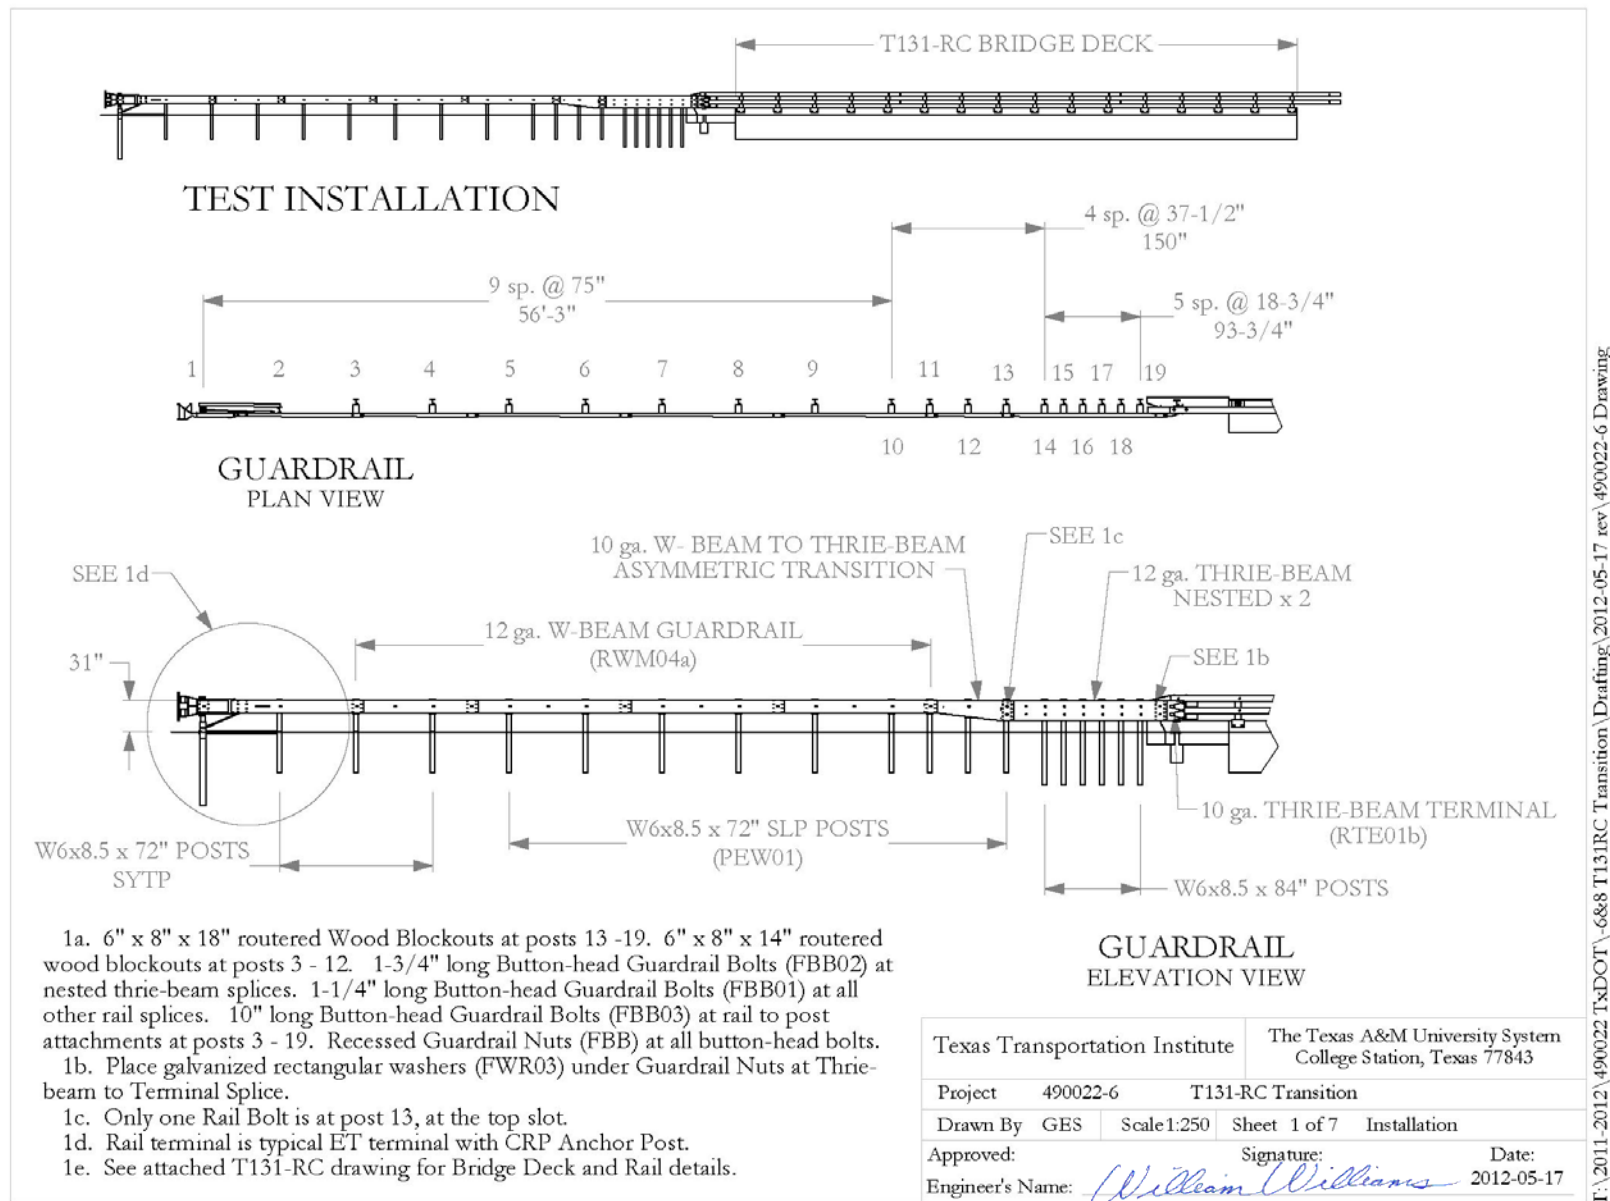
Details of the TxDOT T131RC Bridge Rail Transition Installation.
